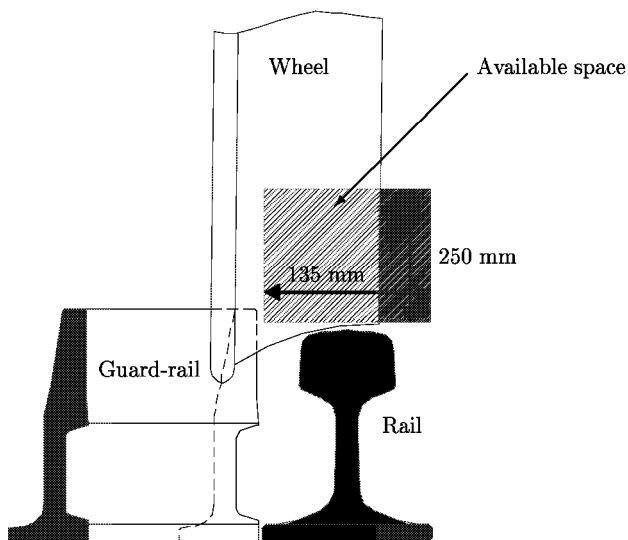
Cut view through the railway track with marked occupied and free space. The guard rail is shown in a view of all possible distances to the rail. The wheel is shown in its maximum displacement in the direction of the guard rail.
